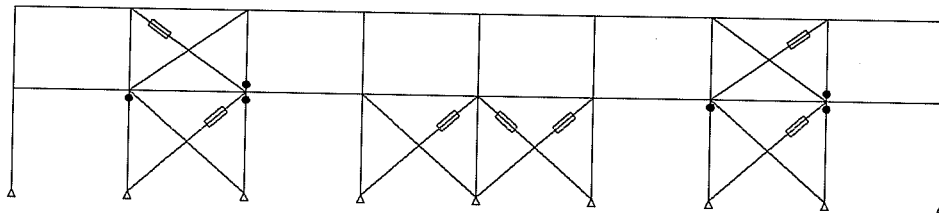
Inelastic Action in Existing Transverse Frames (Axes C and T) - Strengthened Structure
